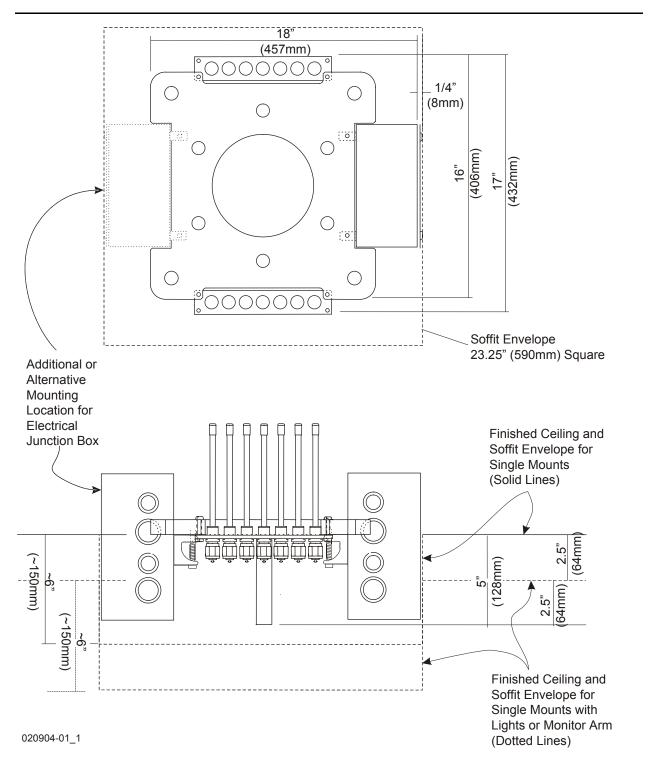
TELETOM® Equipment Management System Soffit Envelope
